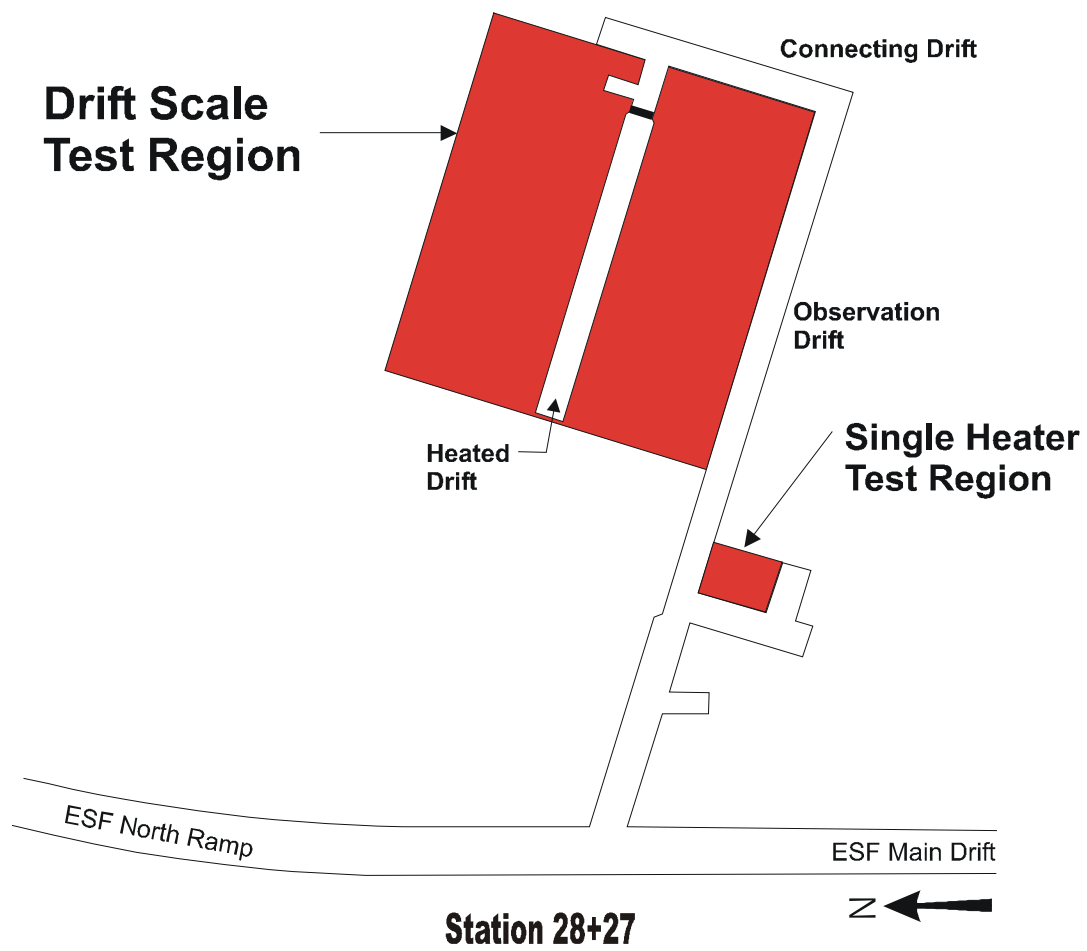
Schematic Plan View of ESF Thermal Test Facility Including the Single Heater test (SHT) and the Drift Scale Test (DST)
